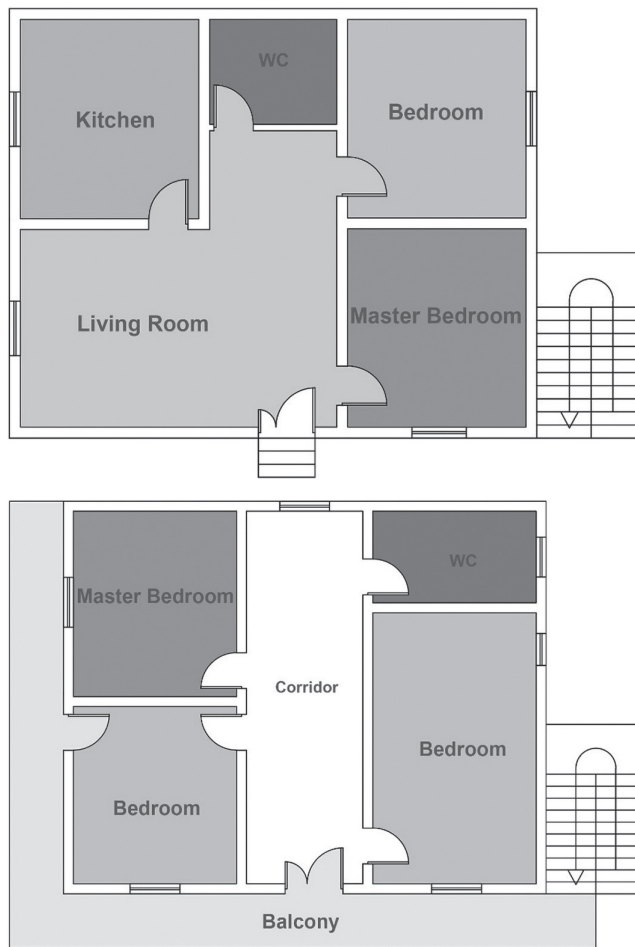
Building layout plans with associated functional spaces for [INT] (ground and first floor).
